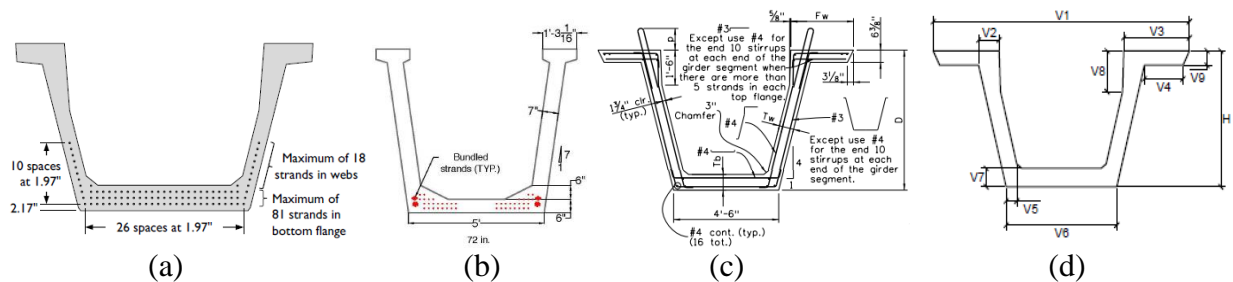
Geometric configuration of tub girders: (a) Texas; (b) Washington; (c) Colorado; (d) variables of a trial section
